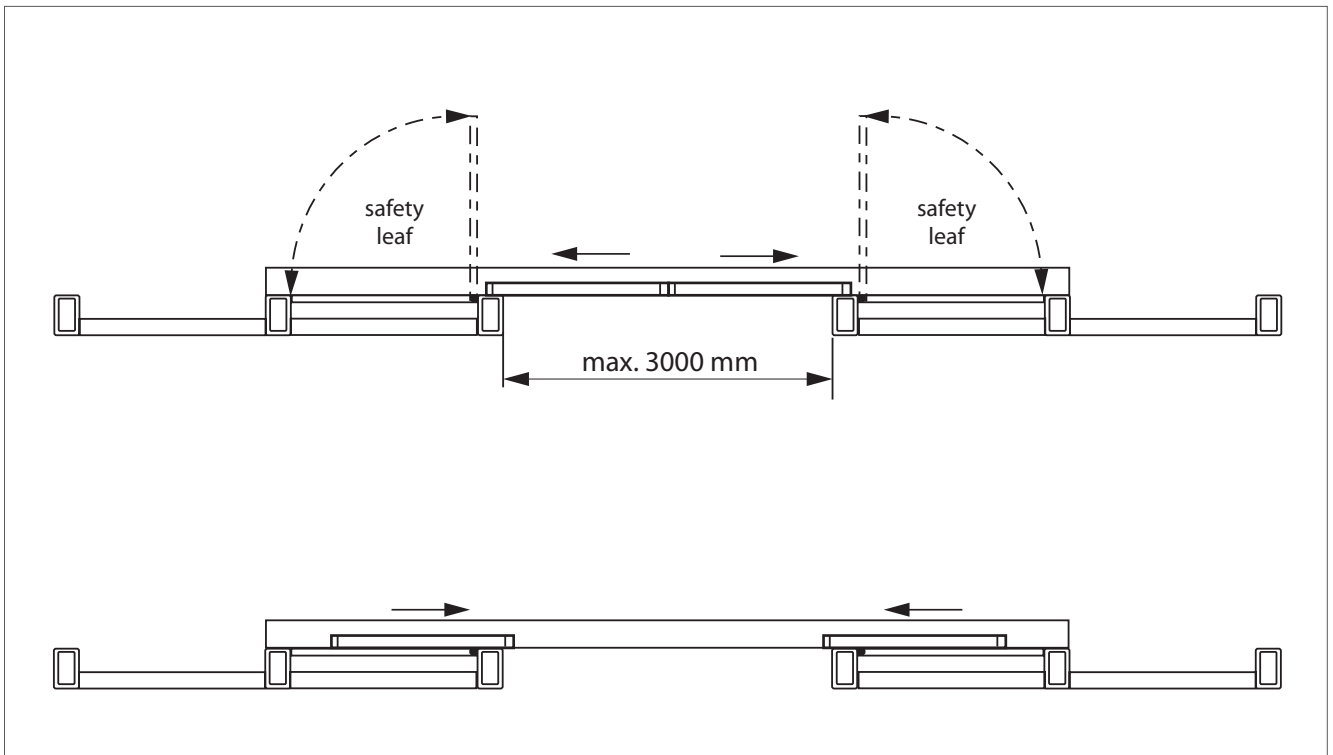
· Façade construction installation, double-leaf version, with safety leaf
